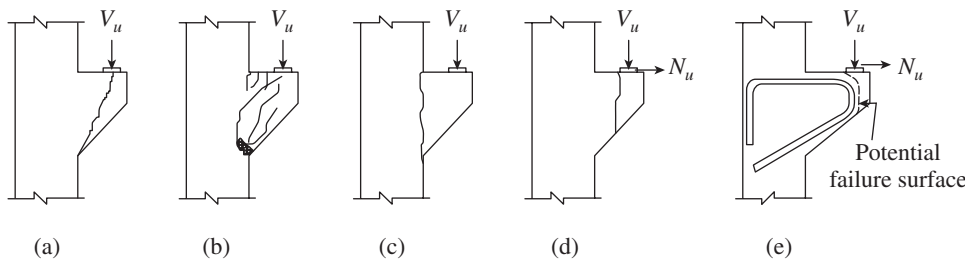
Failure modes of corbel (a) Diagonal splitting failure (b) Shear failure (c) Direct shear failure (d) Vertical splitting (too shallow outer face) (e) Shearing of a portion outside the reinforcement
